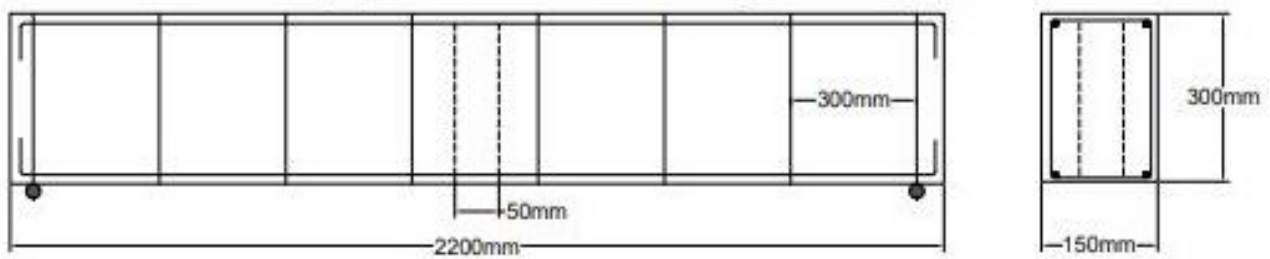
(c). Illustration of test beams (B6 and B8) with opening and 50mm diameter PVC pipe placed vertically at midspan.
